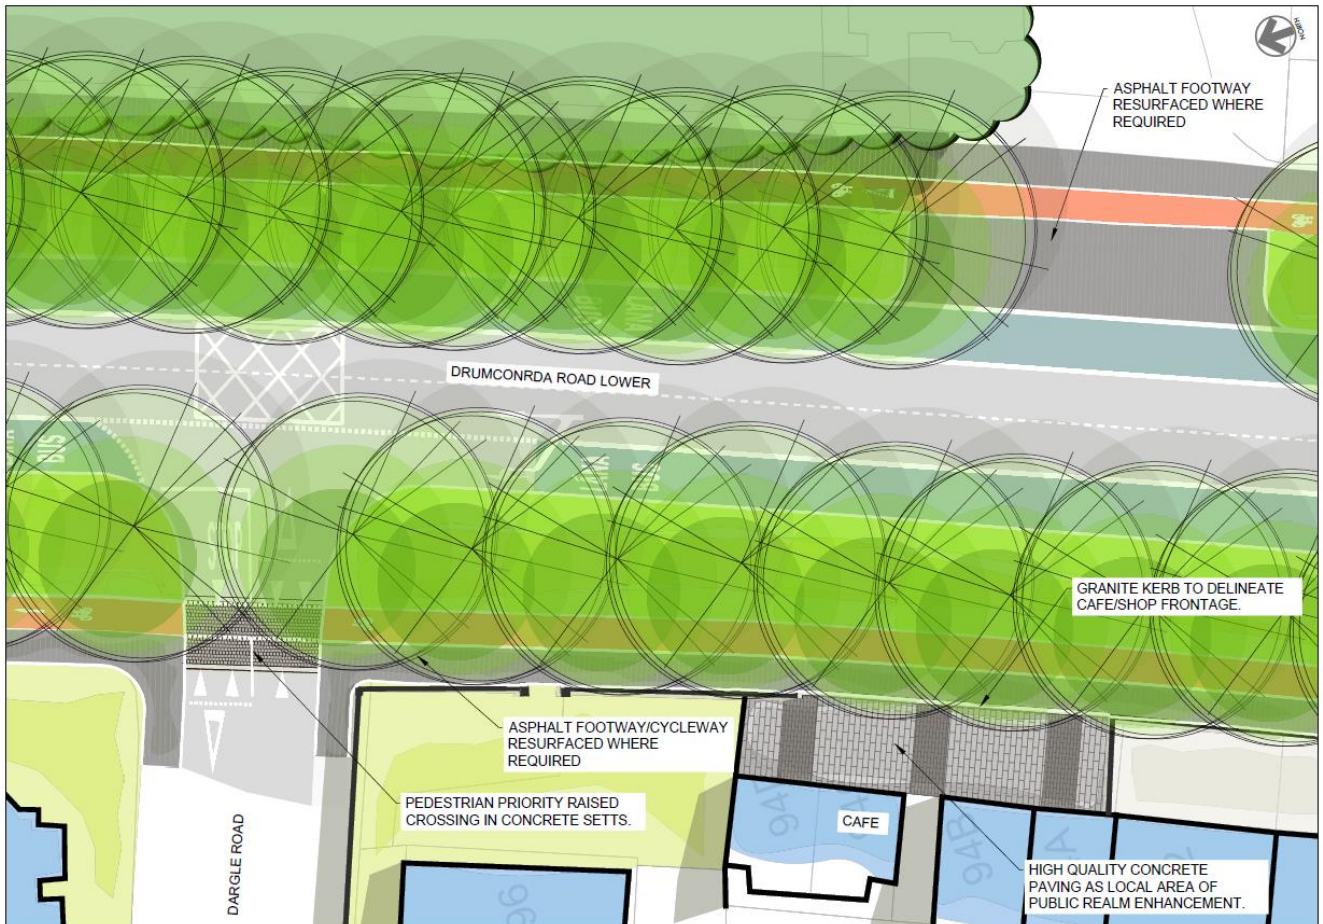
Café and Footways in the Residential Area West of Drumcondra Street Lower Indicative Design
